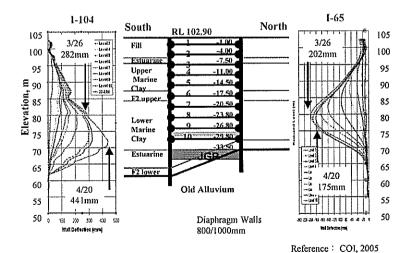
Ground conditions and retaining system at the MRT site next to Nicoll Highway, Singapore
